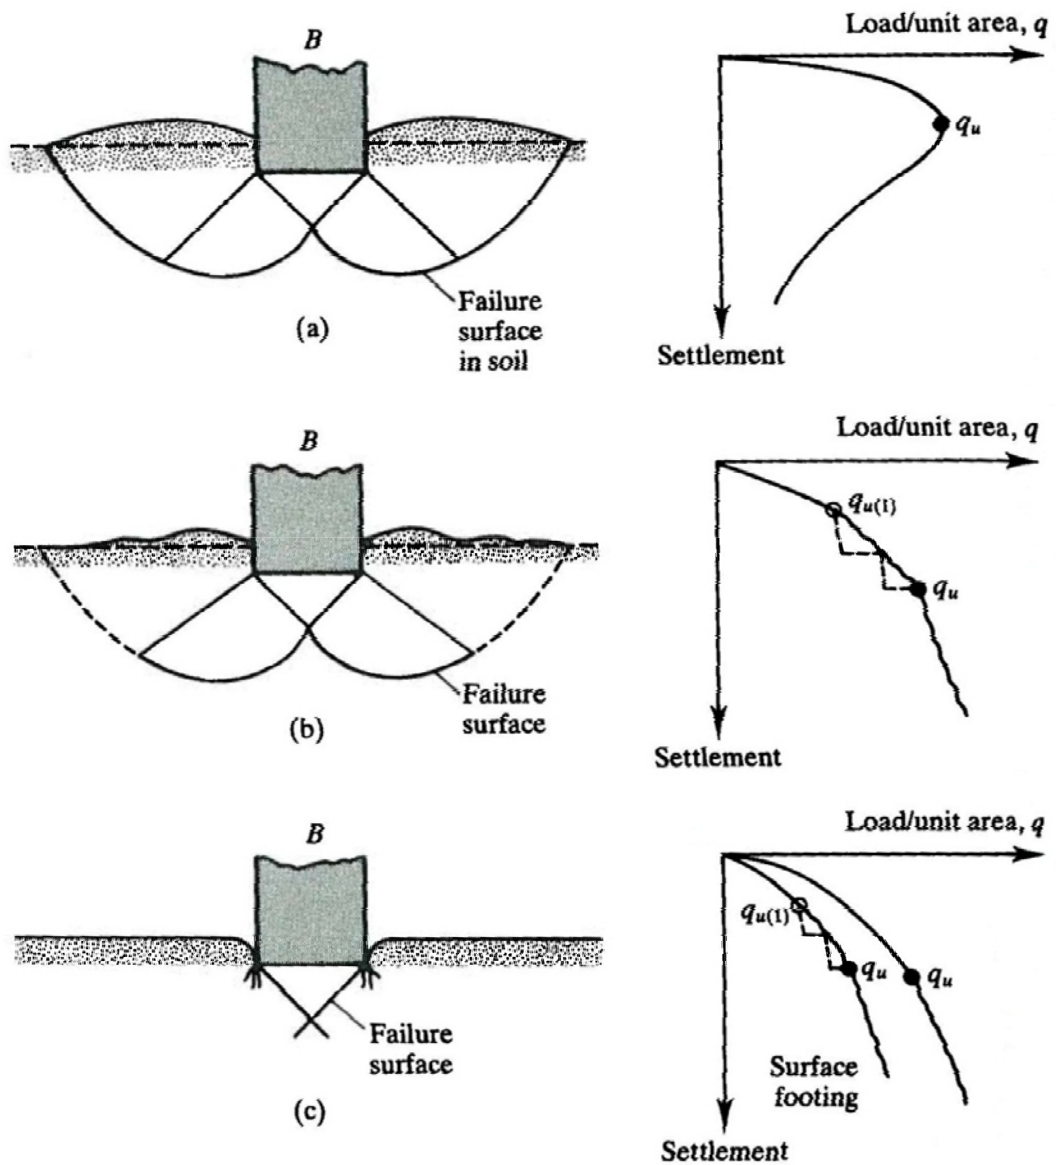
Nature of bearing capacity failure in soil: (a) general shear failure; (b) local shear failure; (c) punching shear failure (Das, 2007)
